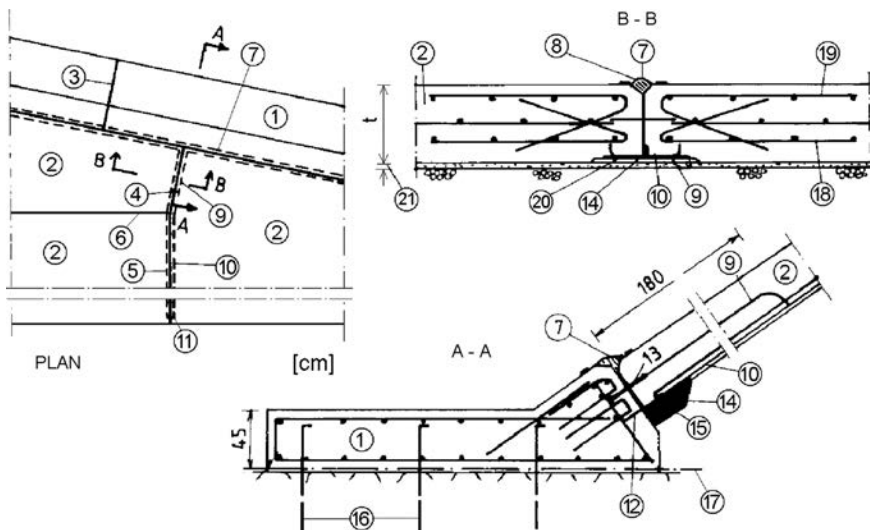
Details of the joint between the facing and the plinth of New Spicer Meadow dam. (1) Reinforced concrete plinth; (2) reinforced concrete facing; (3) control structural joint; (4) end of strengthened joint (section B-B); (5) vertical deformation joint; (6) horizontal control structural joint; (7) plastic membrane over sealing compound (8); (9) copper sheet, type II and III (10); (11) end of copper sheet type II, at elevation 2017 mwl; (12) copper sheet, type I; (13) PVC waterstop; (14) bituminous felt of 6.5 mm or PVC strip; (15) sand asphalt; (16) anchor bolts,  $\varnothing$  2.5 cm; (17) theoretical line of the foundation; (18) main reinforcement; (19) additional reinforcement; (20) mortar bedding; (21) shot-crete, minimum 2.5 cm.
